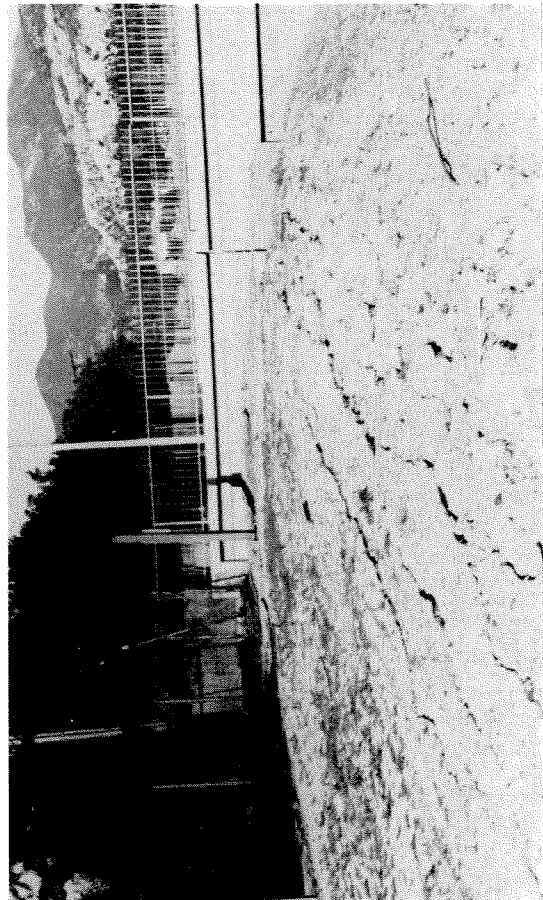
Settlement of southwestern abutment of the Bledsoe Street overpass, Foothill freeway.
